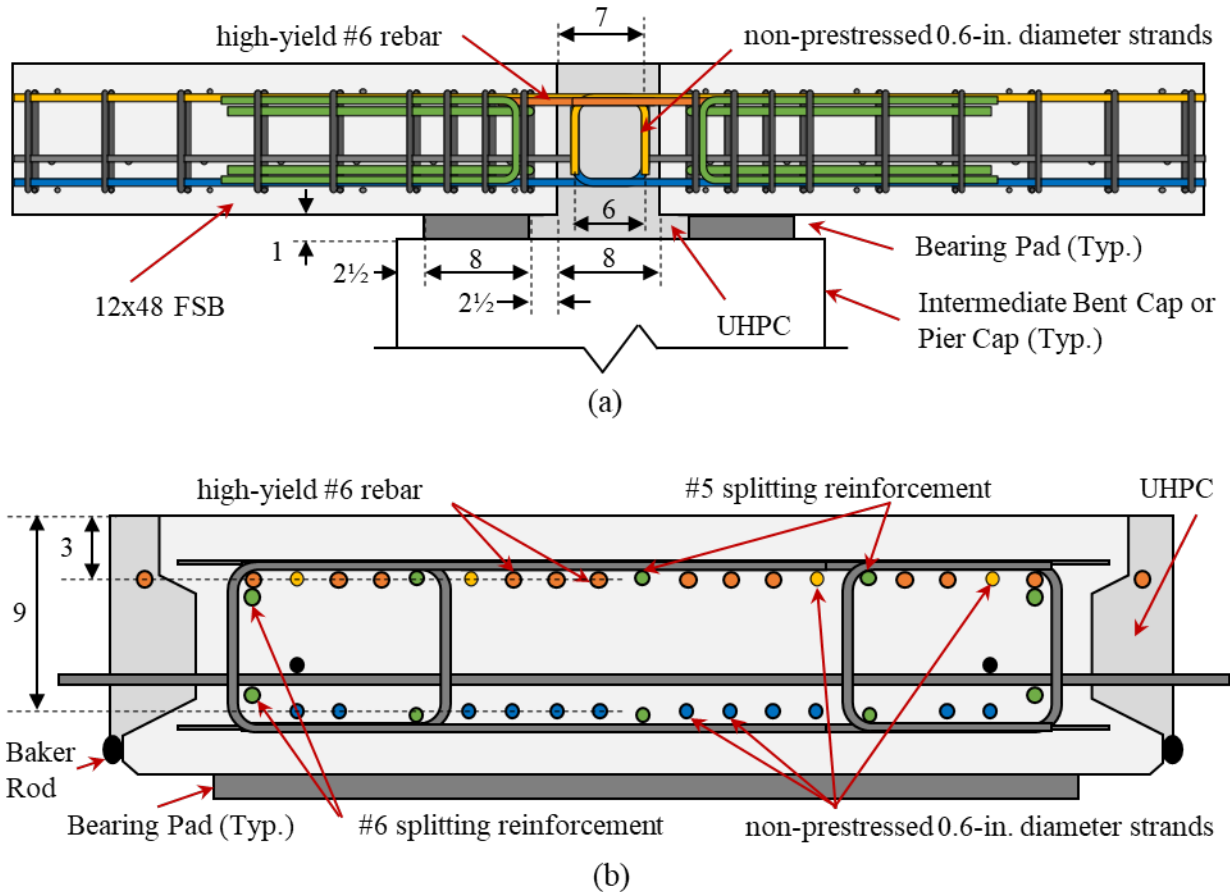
Diaphragm connection detail for 12-in. thick FSB system: (a) section through diaphragm connection and (b) FSB end region reinforcement detail. Note: units in inches
